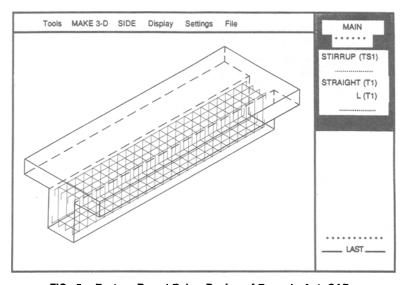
Feature-Based Rebar Design of Beam in AutoCAD
